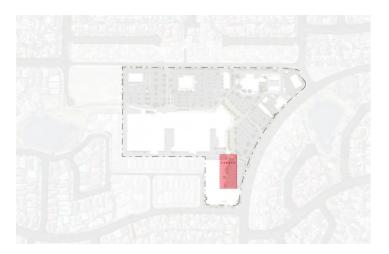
DETAIL PLAN B -ALFRESCO DINING SHARED SPACE
